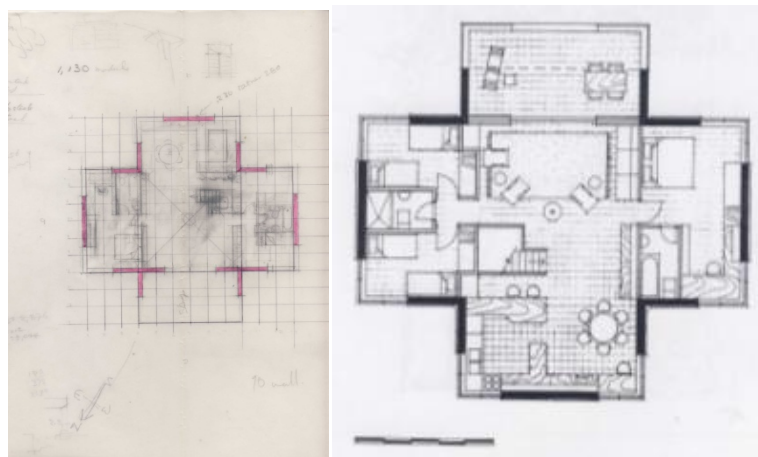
House Beyers (1998): Initial sketch showing grid layout on the left and final sketch plan on the right (Fagan archive - Job No. 9813, undated).
